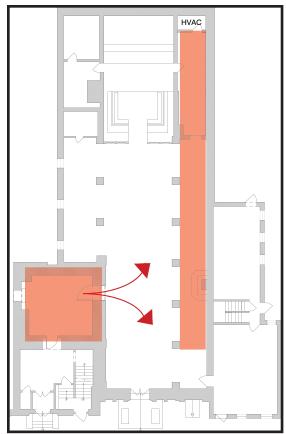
Floor plan showing the proposed exhibition space in the Sanctuary. Credit: Authors.
